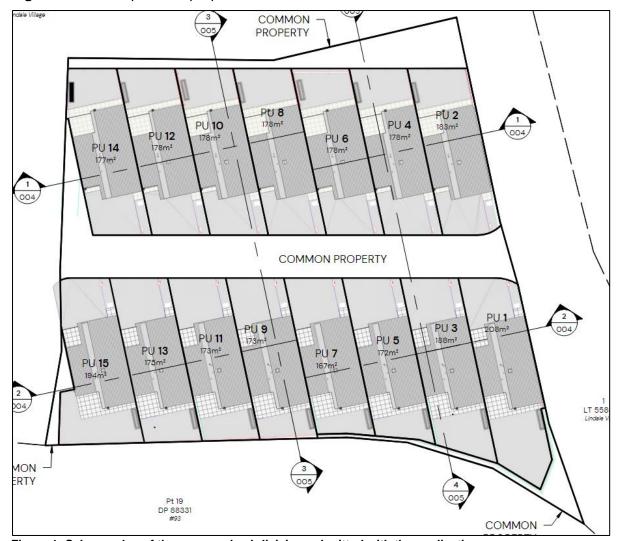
Scheme plan of the proposed subdivision submitted with the application
